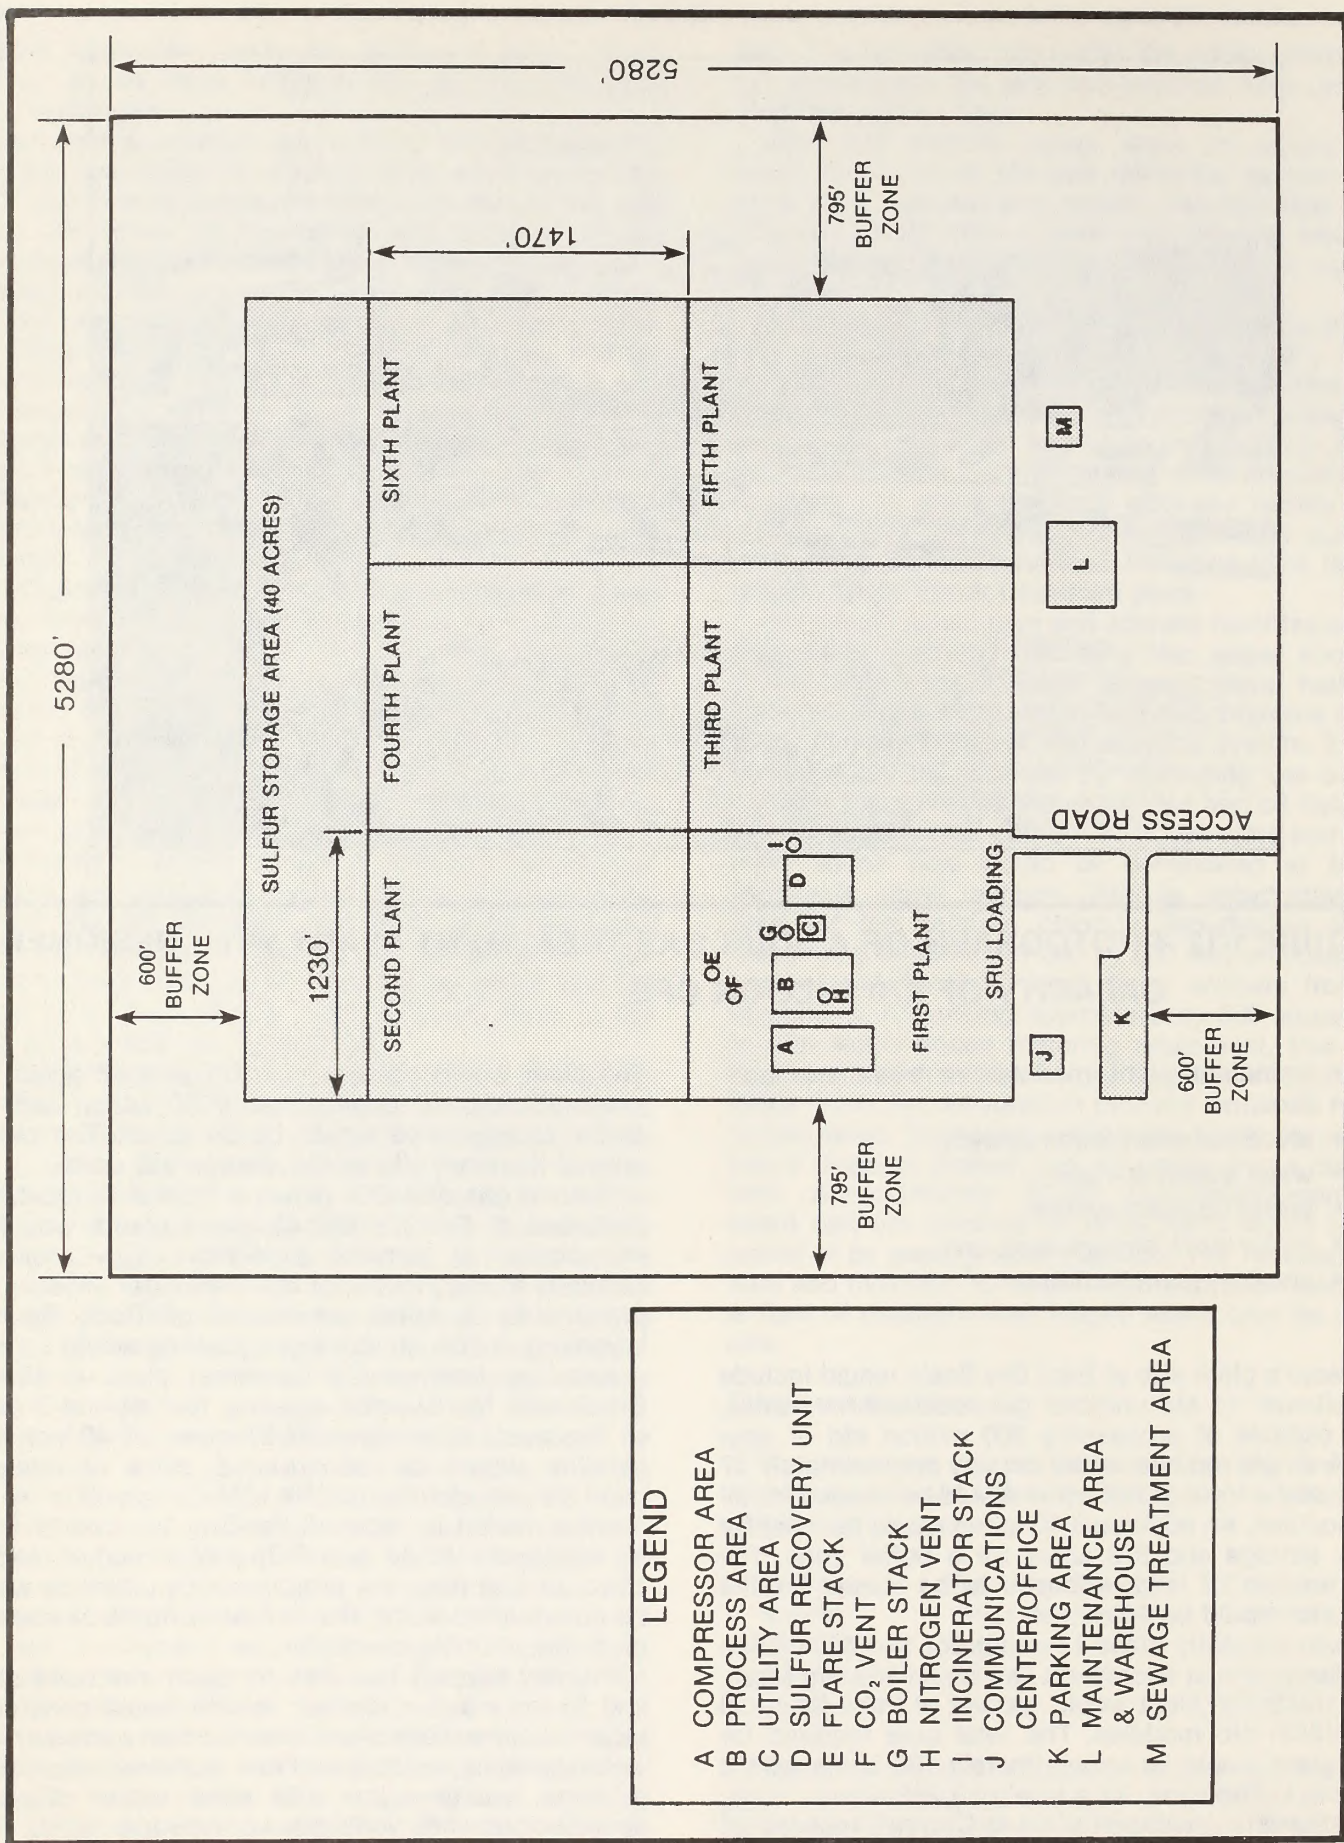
CONCEPTUAL SITE PLAN FOR A 1.2 BILLION CFD GAS TREATMENT PLANT
